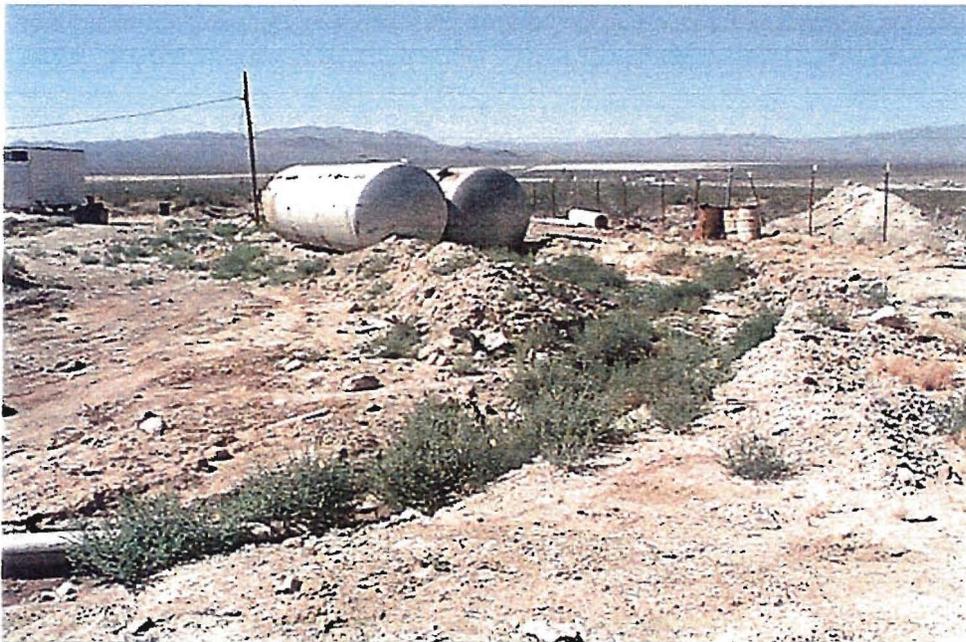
Taken by J. Mur 6/25/98. Looking south. Shows tanks on west side of the Becki M mill site.
